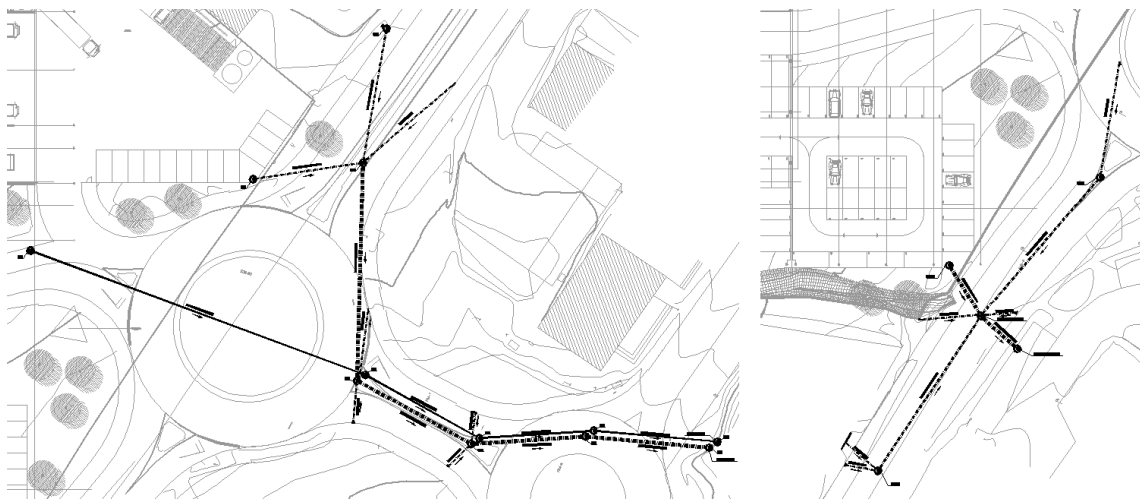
Exterior infrastructures for the connection to the public sewerage system
